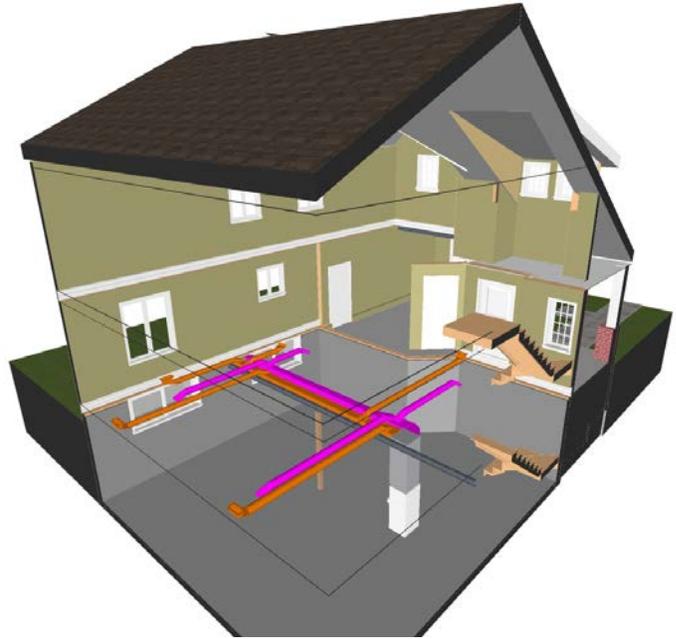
Supply Ducts for Basement & Main Floor Zones
